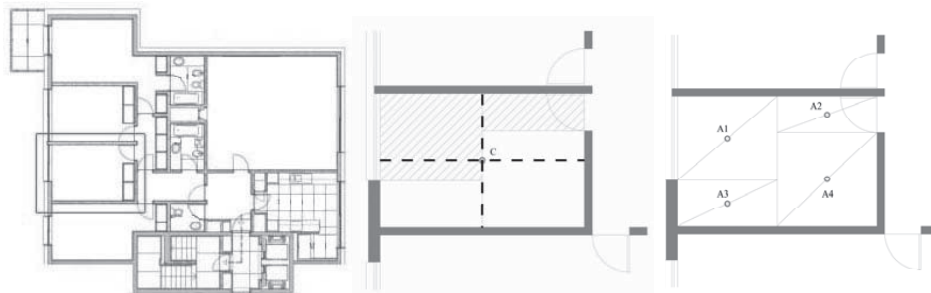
Boa Vista House, architect: Alvaro Siza, Porto, Portugal. Subdivision of a sleeping room in enclosed spaces and placement of the geometrical centre point *A* of each enclosed space considering the projection of the openings (door and window) on the vertical axial line *y
